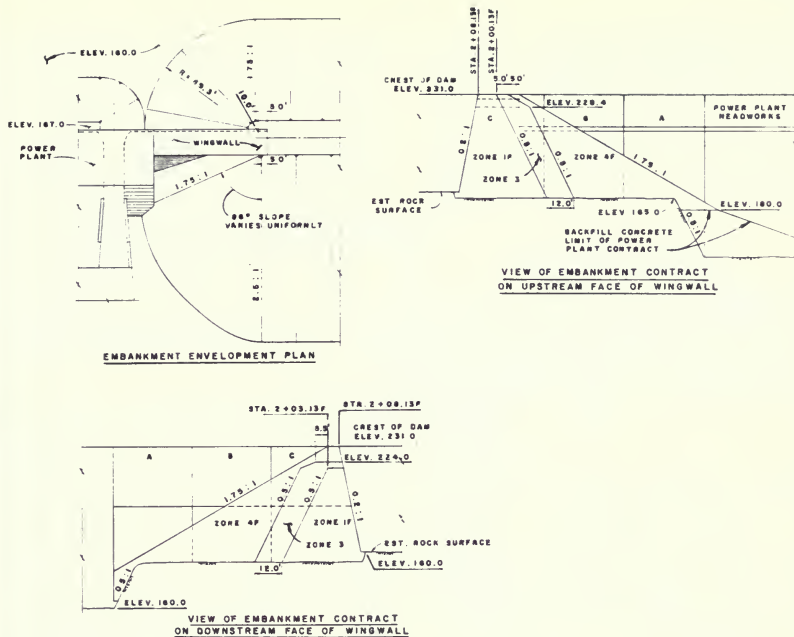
Wingwall Dam Envelopment by Forebay Main Dam Embankment
